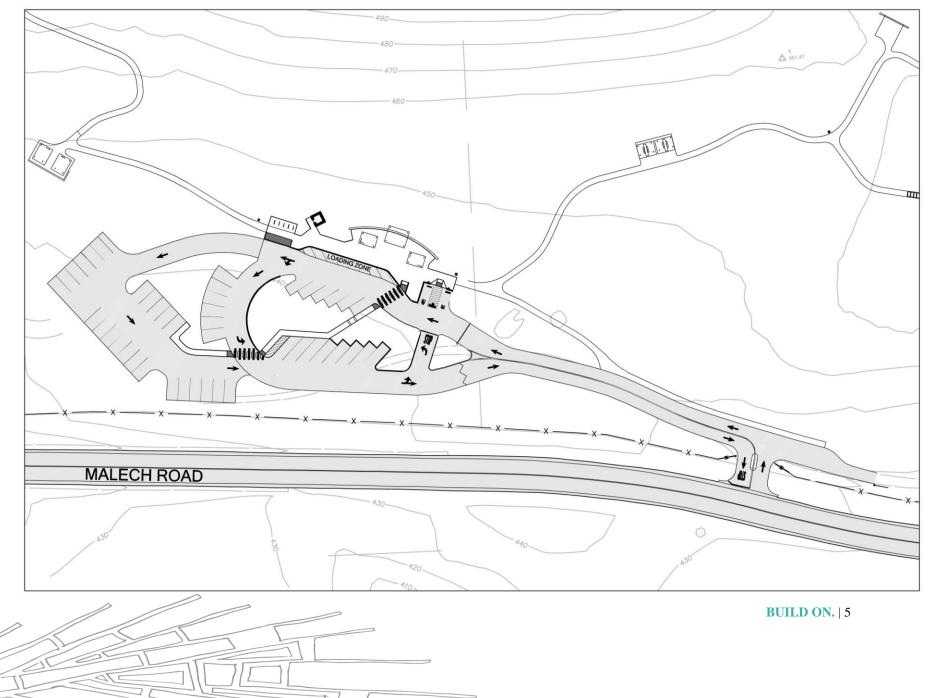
Coyote Ridge Open Space Preserve Planned Facilities
